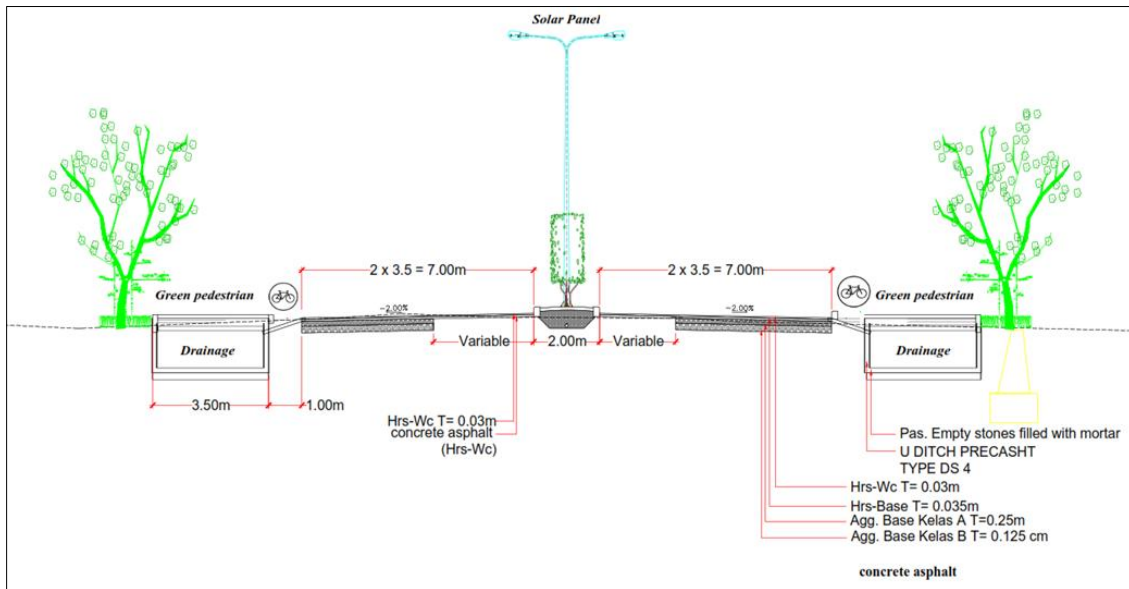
Design of road improvement on the Maruni-Drs. Esau Sesa Street
